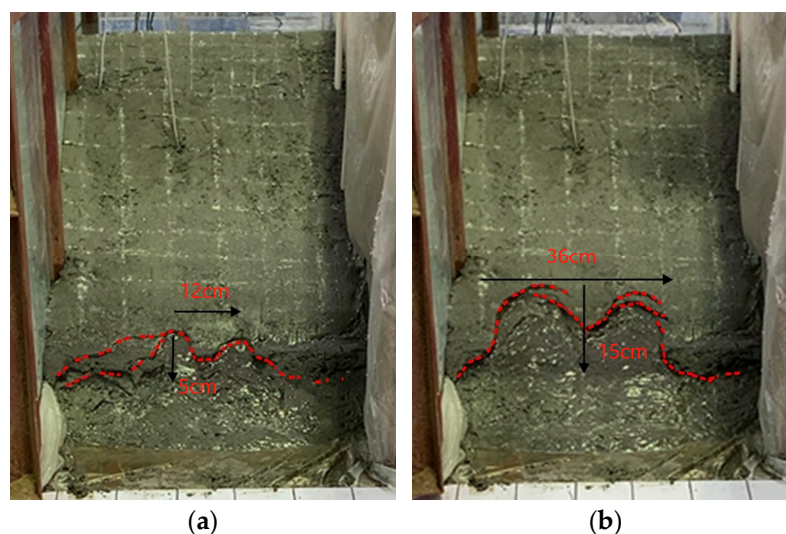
Deformation of slope surface: (a) Dam foundation swamping; (b) Sliding of dam foundation.
